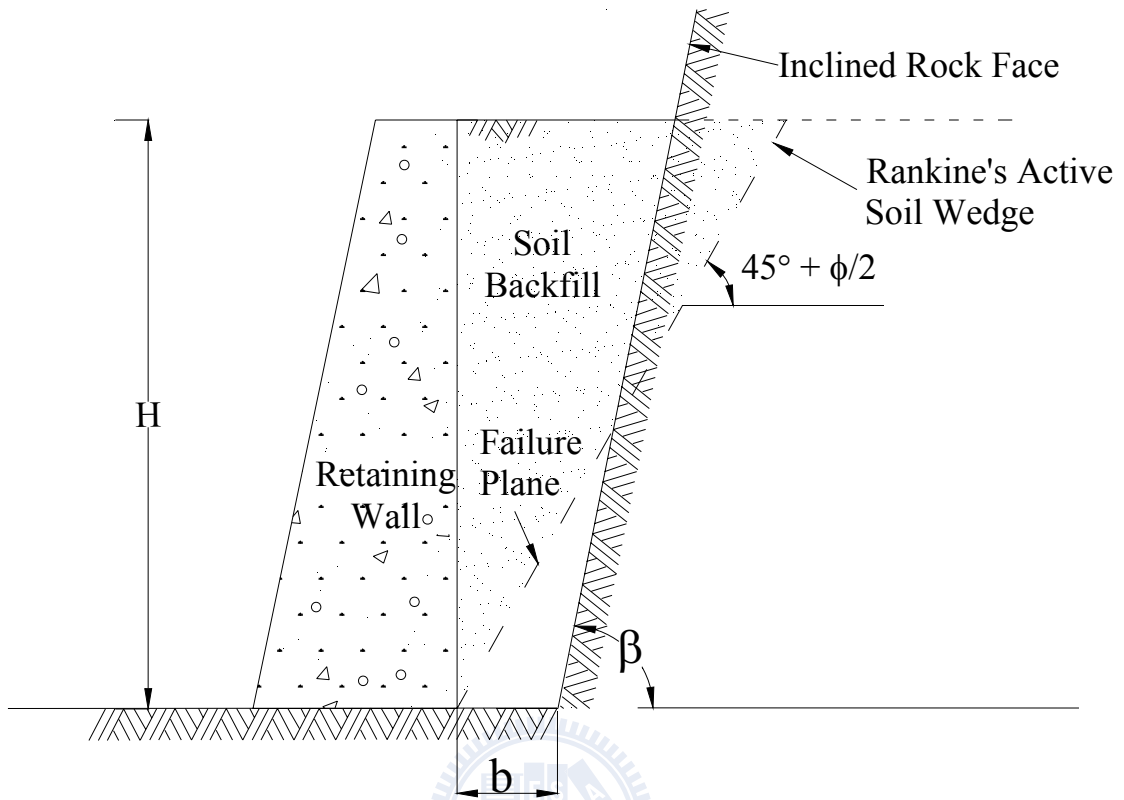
Retaining walls with intrusion of a rock face into backfill
